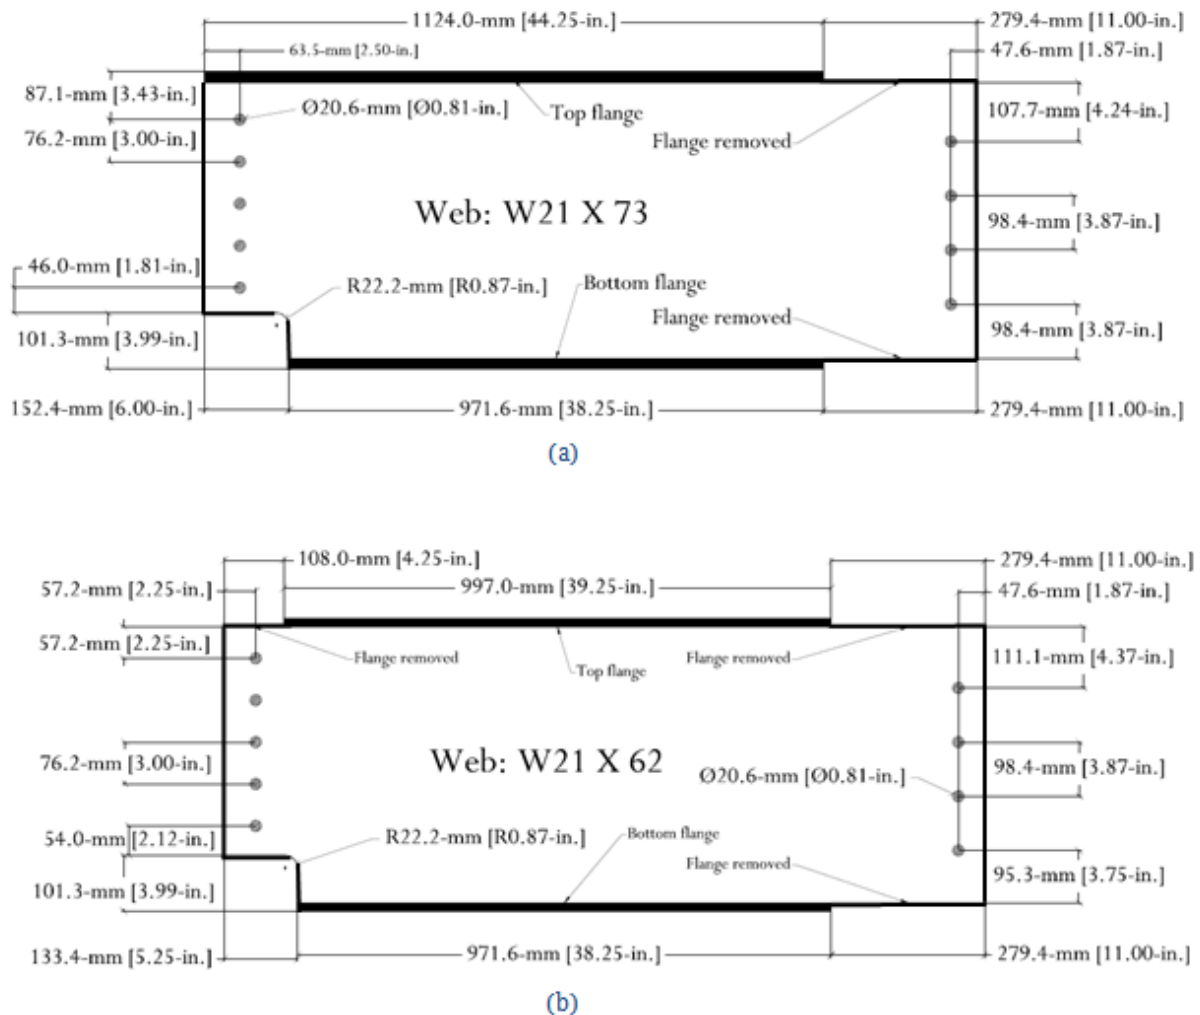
a) Stringer detailing used with Connection Type I b) Stringer detailing used with Connection Type II
